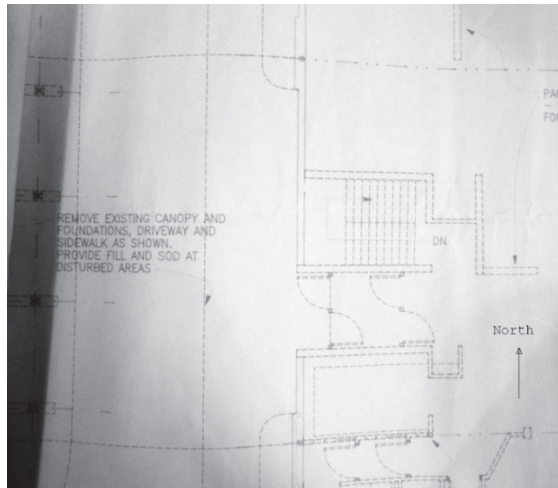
Removal plan for west portico, January 17, 1996 (Building plans)
